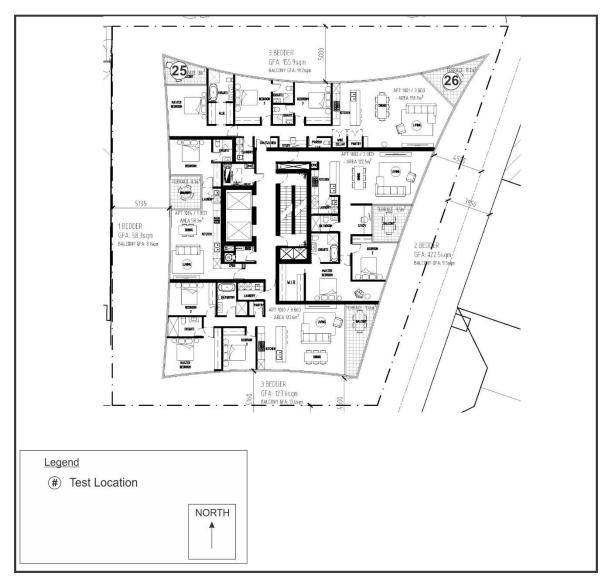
Level 11 Test Locations of the proposed 11-17 Dorcas Street Development for the Proposed Configuration.
